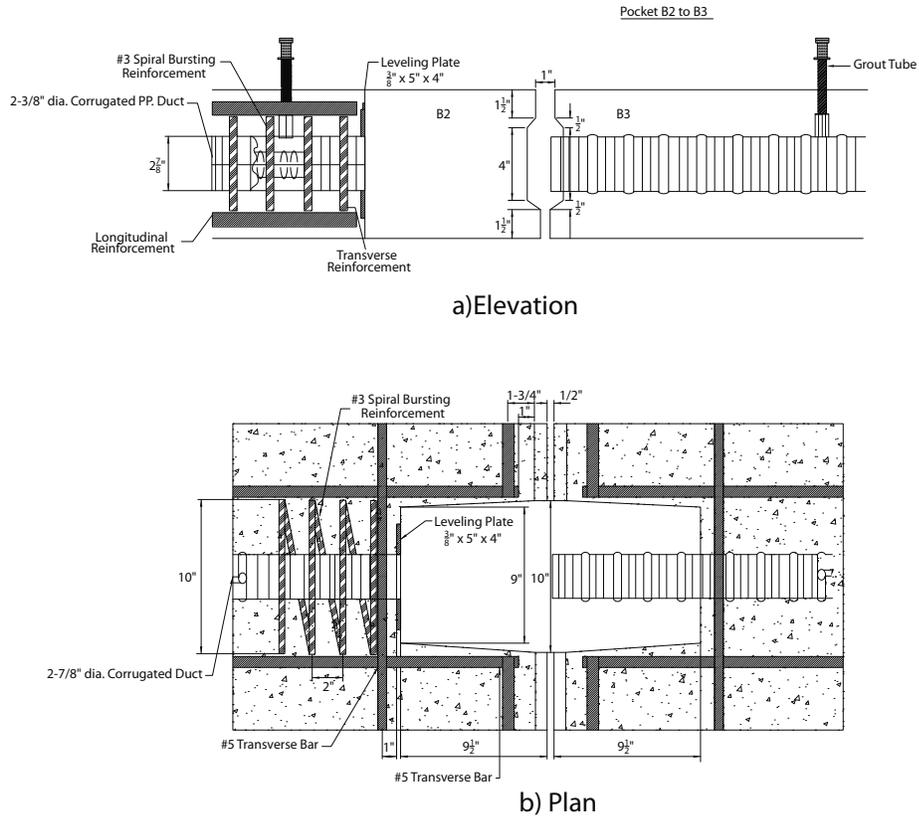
Details of the precast slab where coupling is required.
